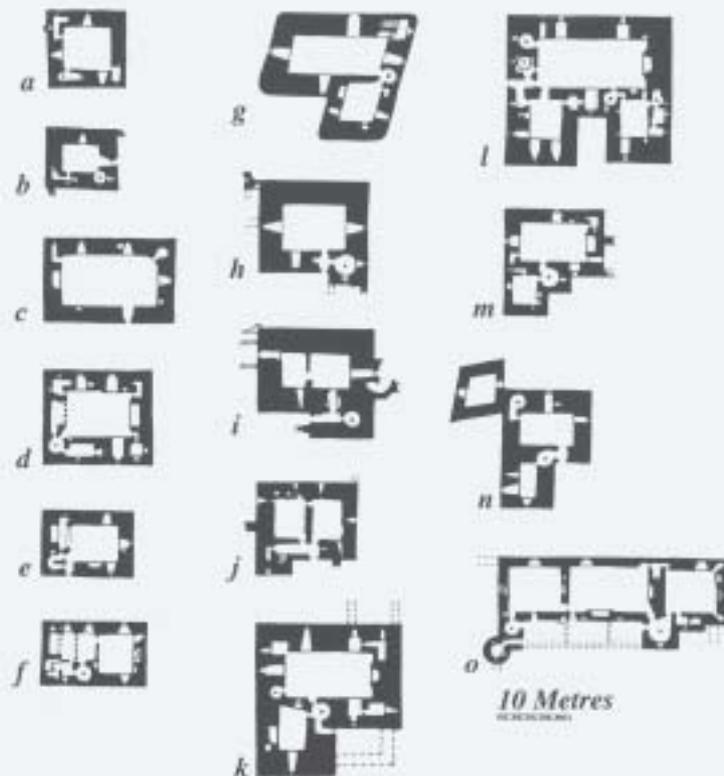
Plans of tower-houses: a. Moy (first floor); b. Breachacha (first floor); c. Threave (first floor); d. Comlongan (first floor); e. Little Cumberae (first floor); f. Saddell (first floor); g. Neidpath (entresol floor); h. Rosyth (ground floor); i. Craigmillar (ground floor); j. Edzell (ground floor); k. Cessford (first floor); l. Boethwick (first floor); m. Balvaird (first floor); n. Dundas (ground floor); o. Melgund (first floor).
